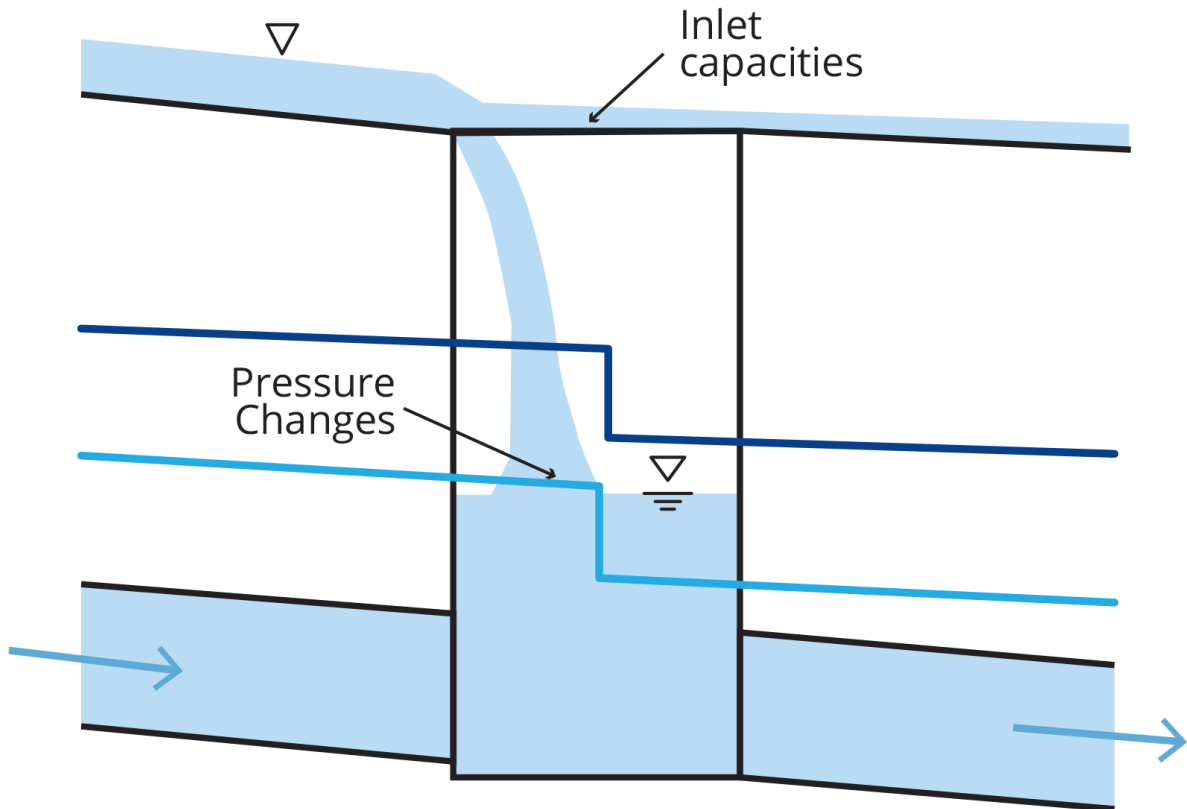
Idealised Hydraulic Issues Impacting on Inlet Structures
